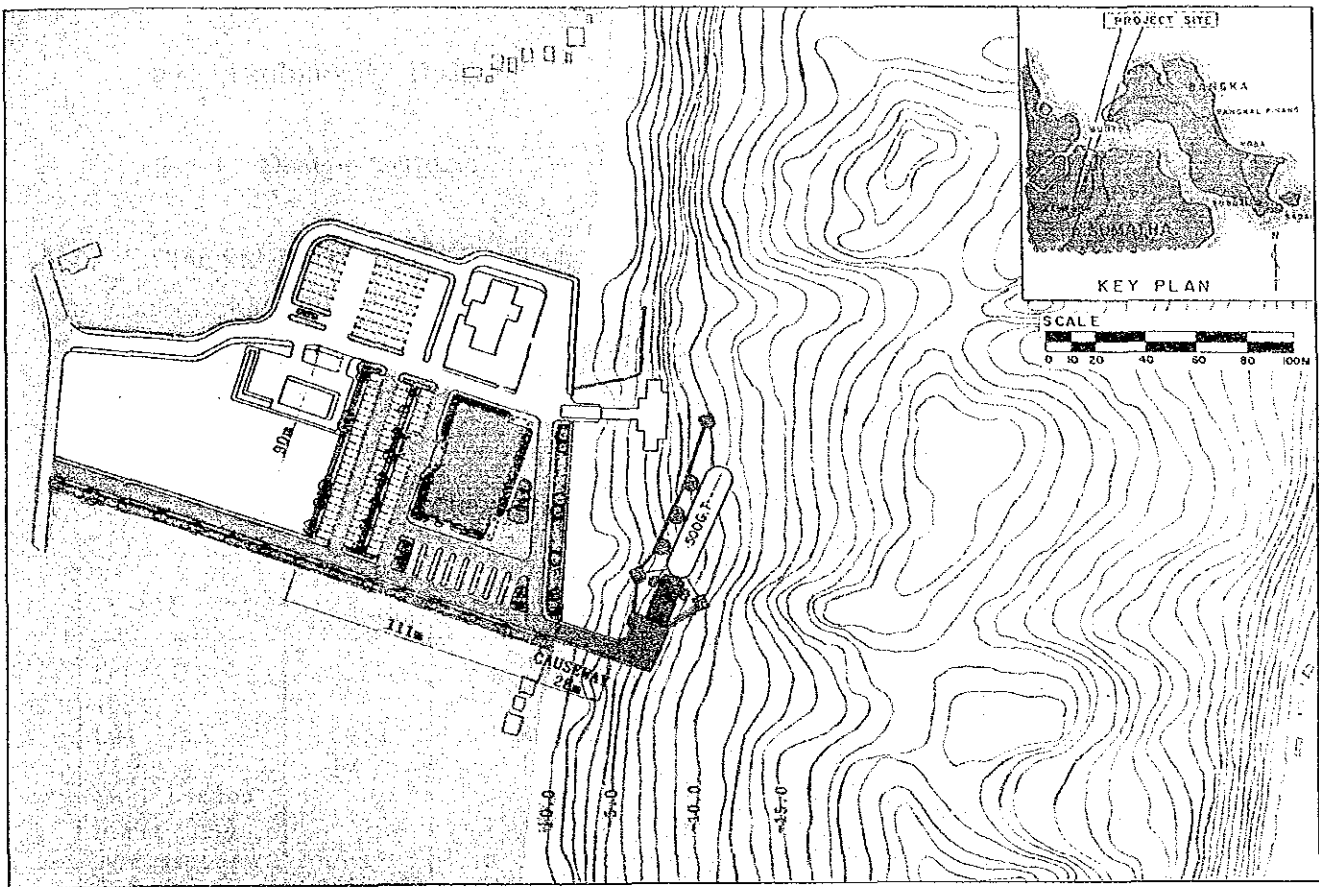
Layout of Palembang Ferry Terminal
